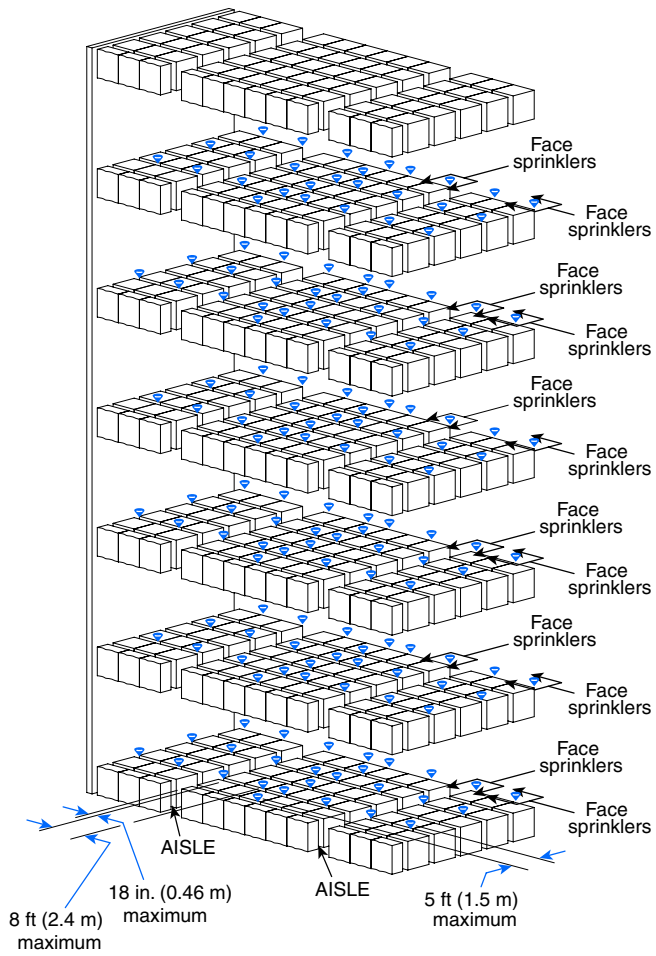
Positioning of In-Rack Sprinklers in
